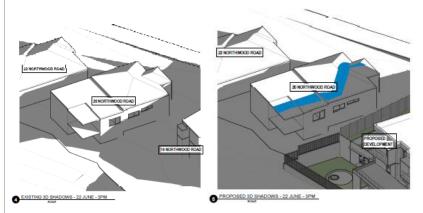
Existing (left) and Proposed (right) overshadowing on 20 Northwood Road at 3pm (Source: Morrison Design Partnership)
